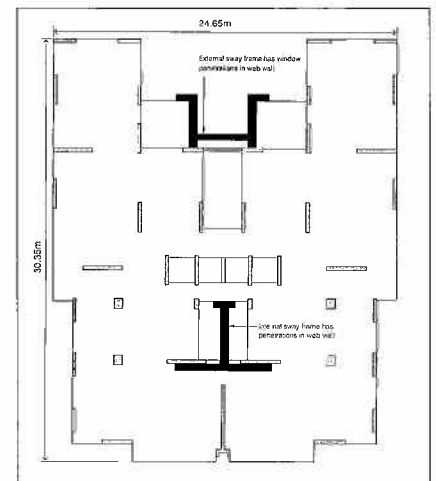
The consultant's final sway frame design. The frames occupied a small plan area, and therefore needed thick wall construction at lower levels to achieve the required stiffness
